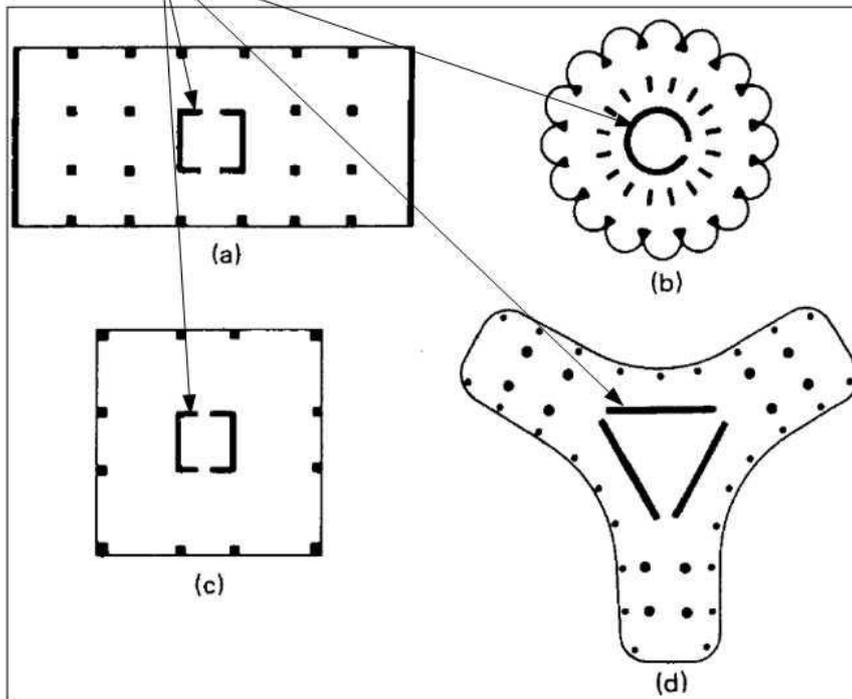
Different arrangement of shear walls that may provide frame bracing.
